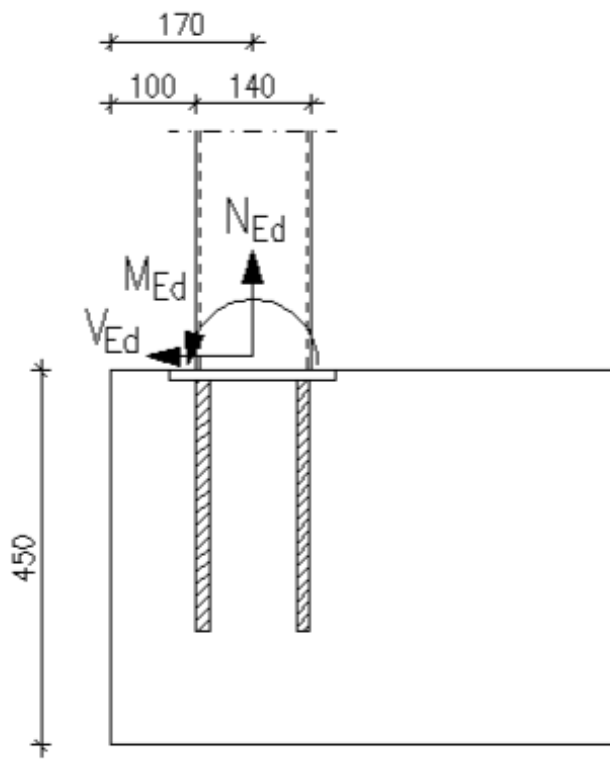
Design example of a KL fastening plate without additional reinforcement, dimensions of the fastening plate
